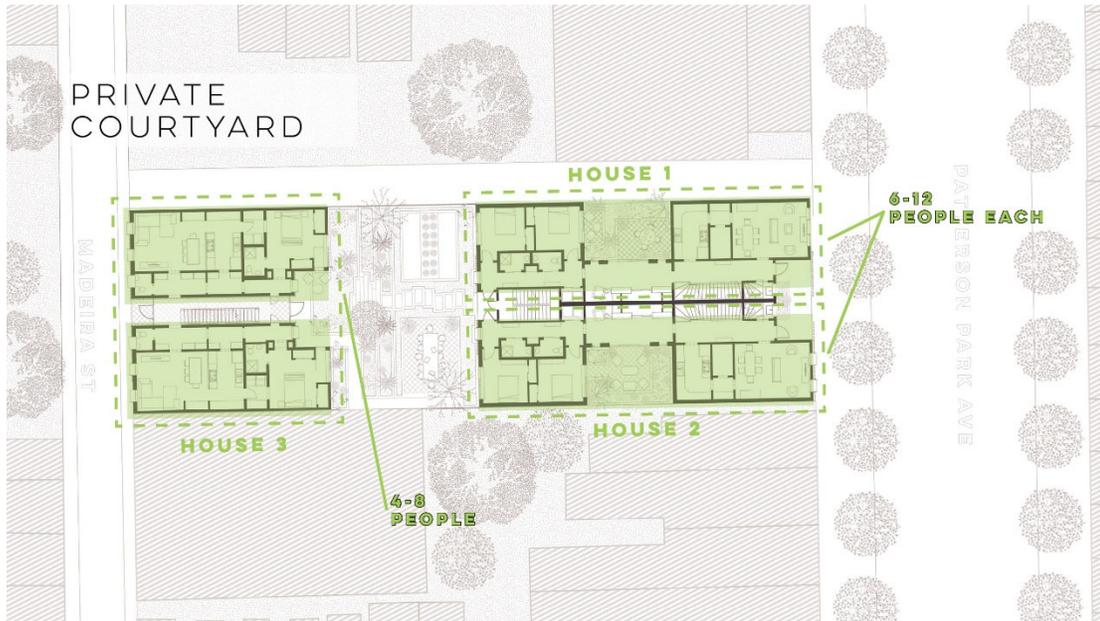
The house layout of the private courtyard lot and their respective occupancies, (Source: Author)
